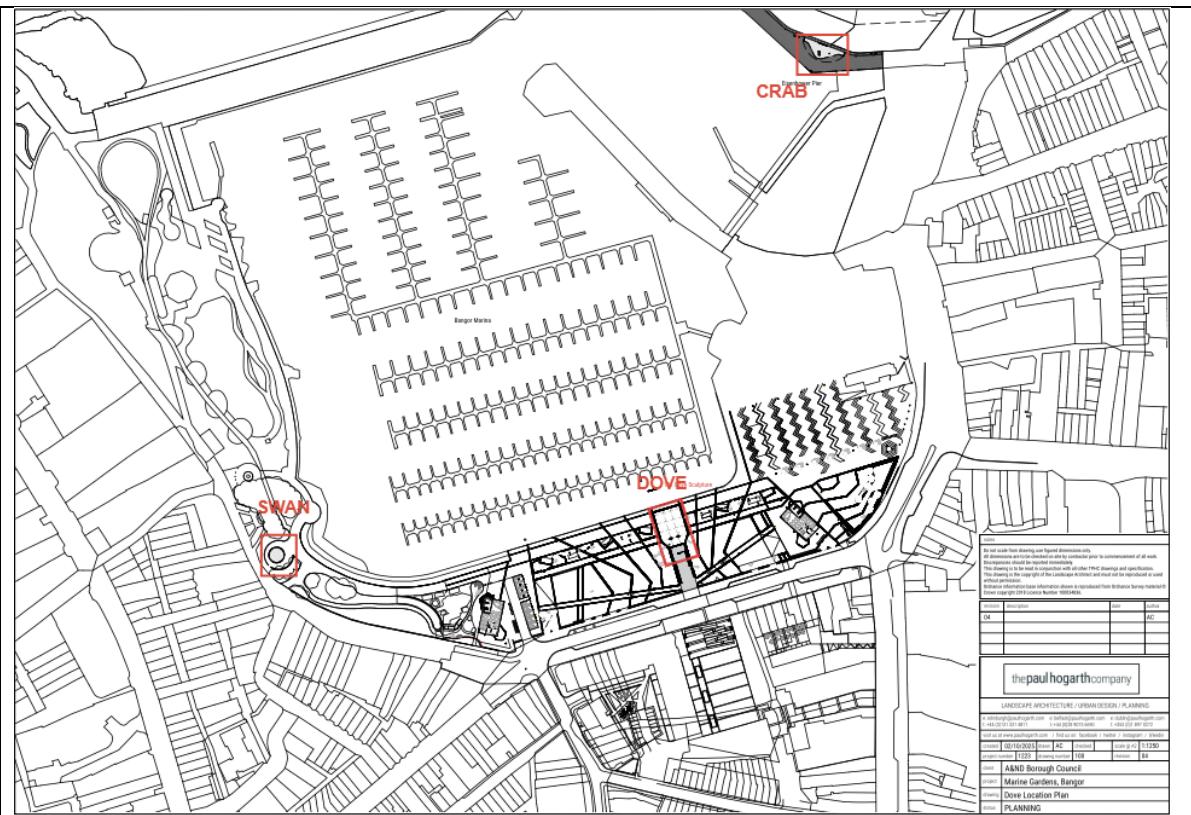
Site Layout showing approximate locations of each proposed sculpture
